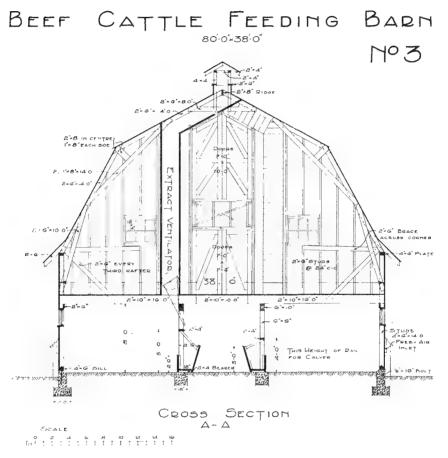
Simple and strong plank frame construction. The extract ventilators are placed so that they are not in the way of the hay fork.
